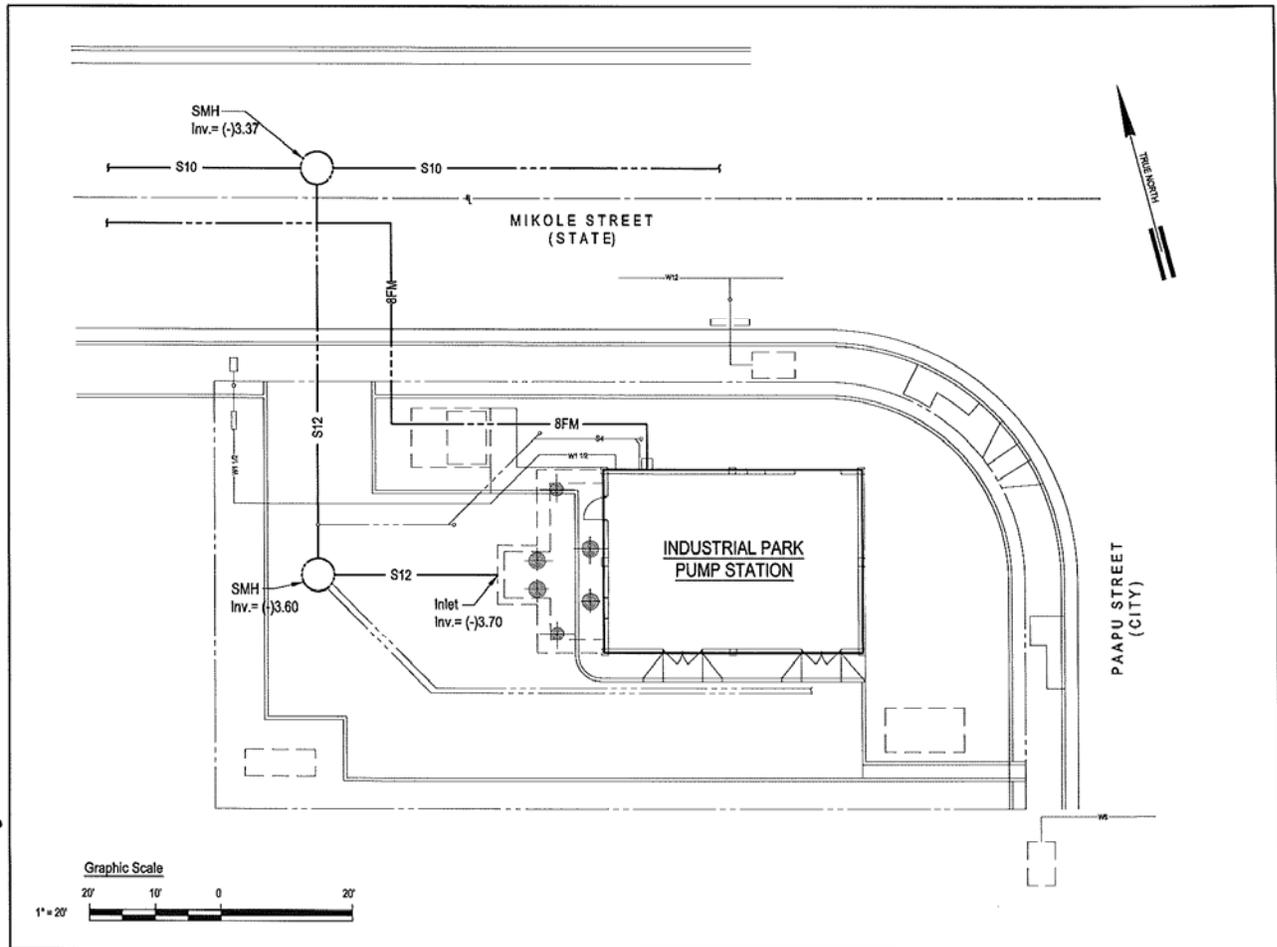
Existing Sand Island Industrial Park PS Site Plan
